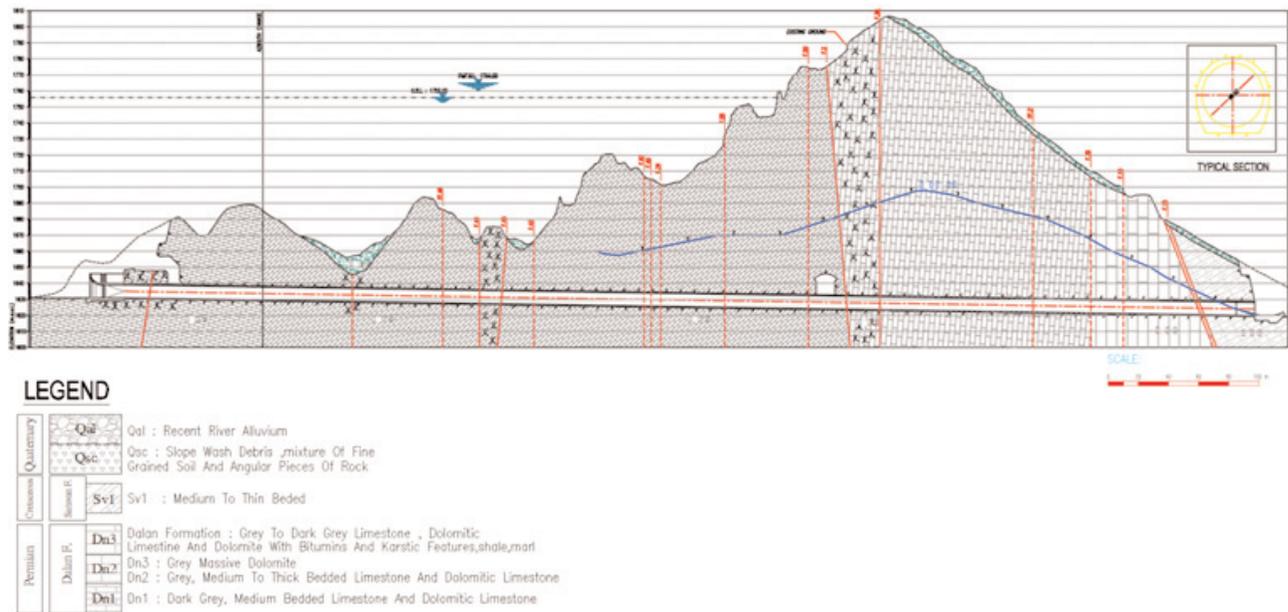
Engineering geological profiles of the excavated sections of the diversion tunnel [2].
